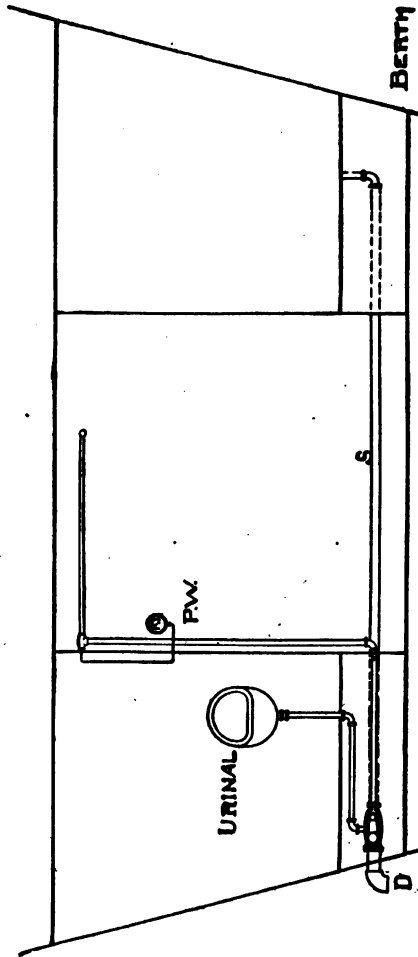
Elevation Showing Piping to Water-jet Eductor.
